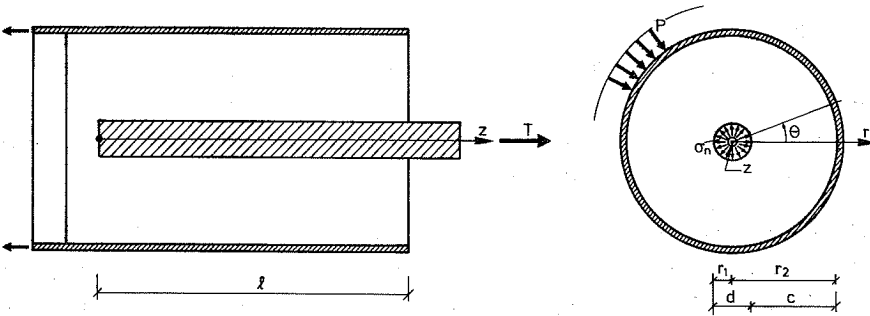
Anchorage of a bar in a circular concrete body surrounded by a steel ring.
